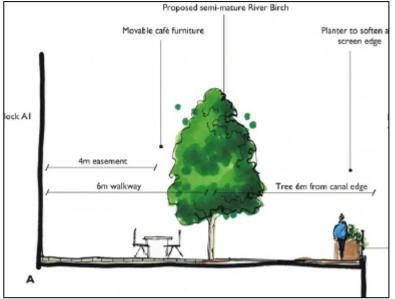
Section A-A1 - Ligurian Walk – Canal side section
